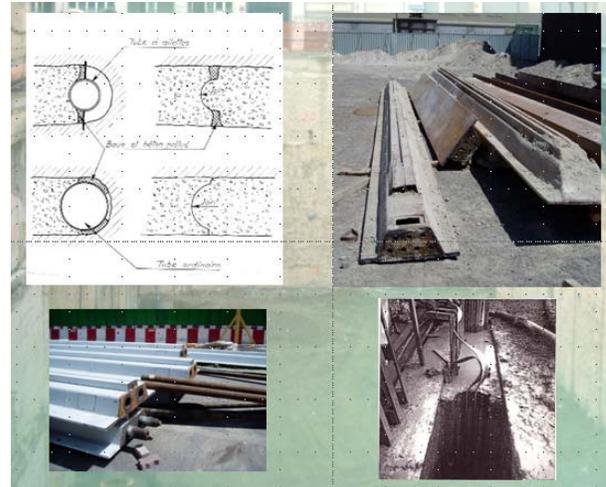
Joints with simple pipes or sheet piles with or without plastic membrane.
